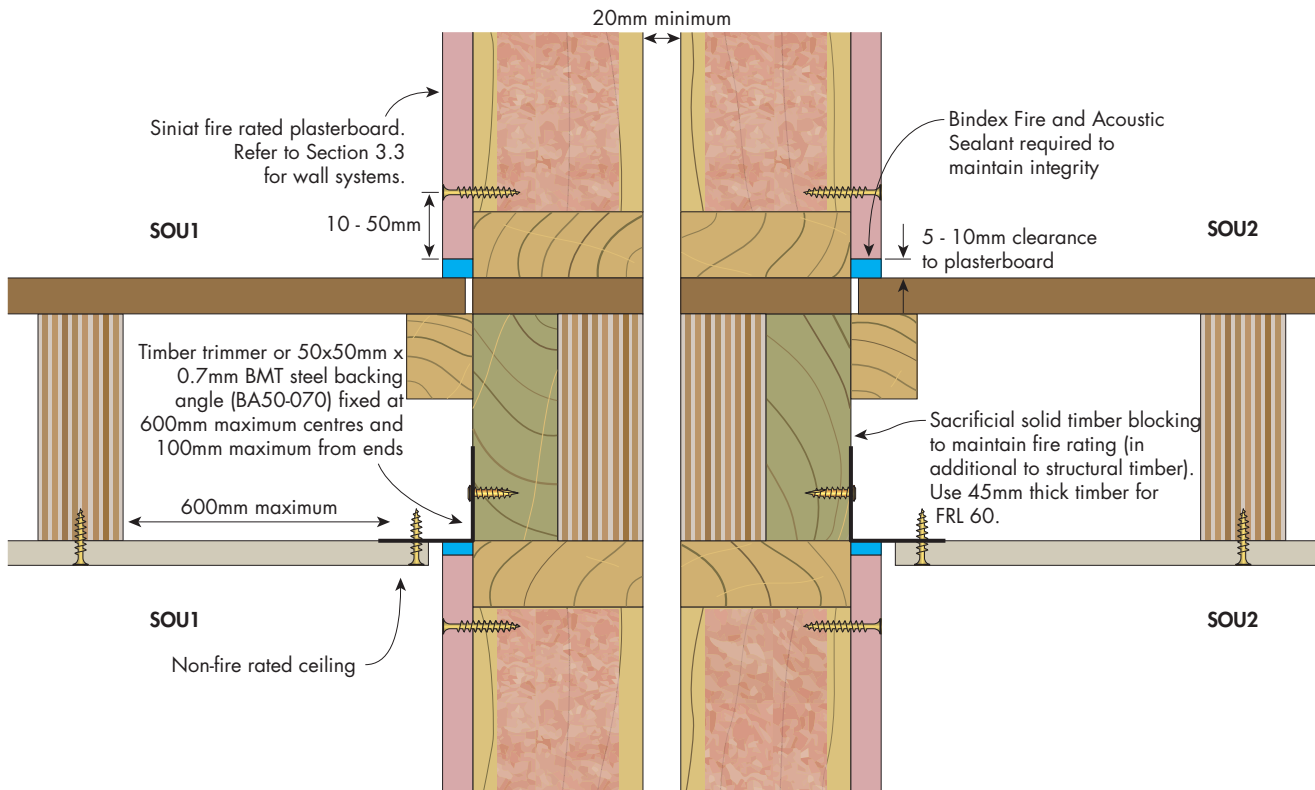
Separating Wall with Suspended Ground Floor Section
